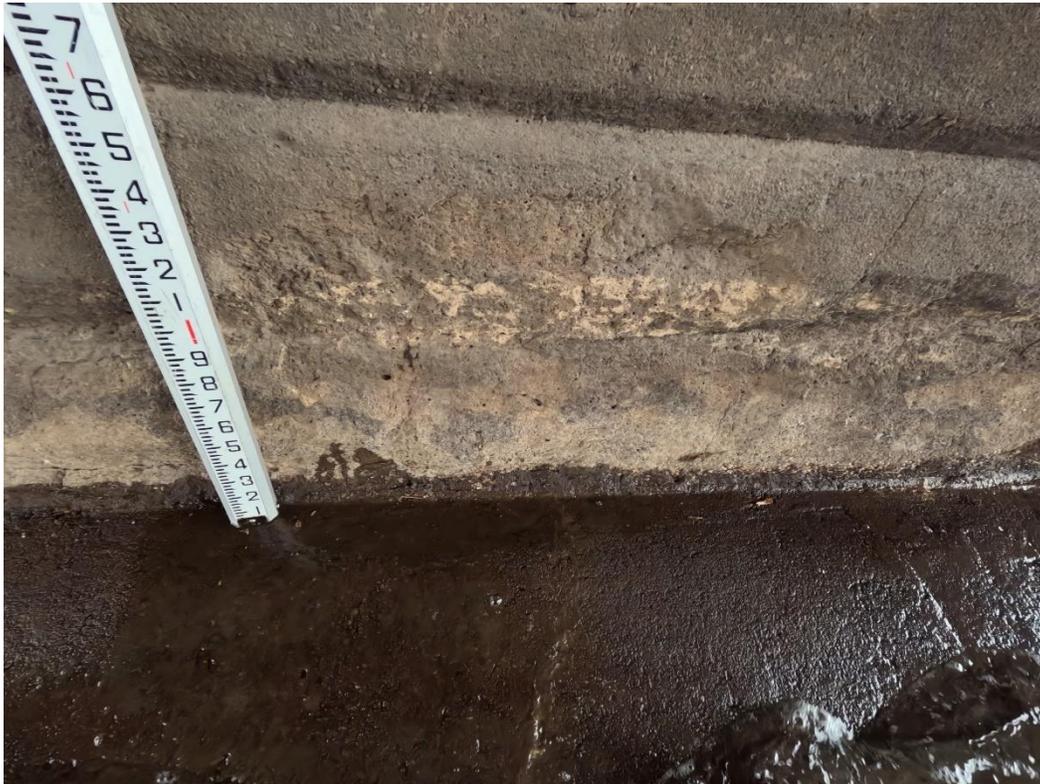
SOUTH PIER TYPICAL CONCRETE CONDITION LOOKING NORTH
